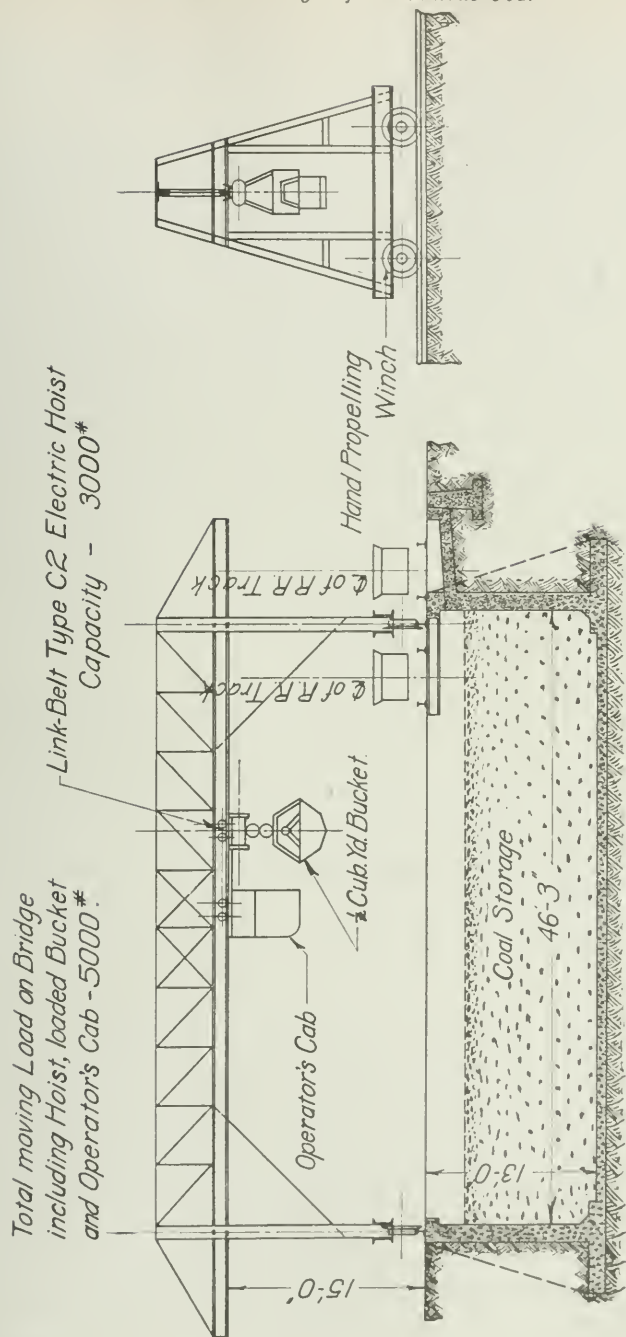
Storage Pit and Bridge of the Western Clock Works.
